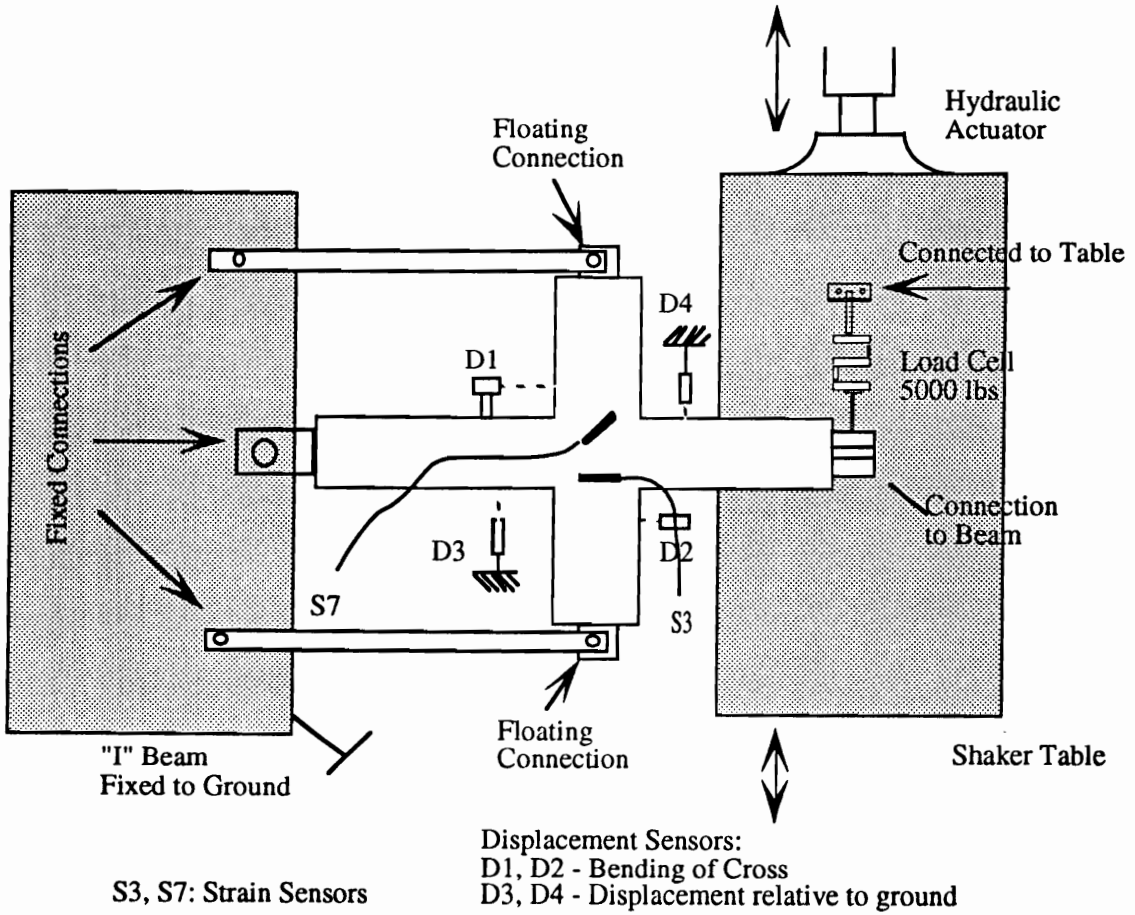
Details of the Reinforced Concrete Test Structure.<sup>66</sup>
